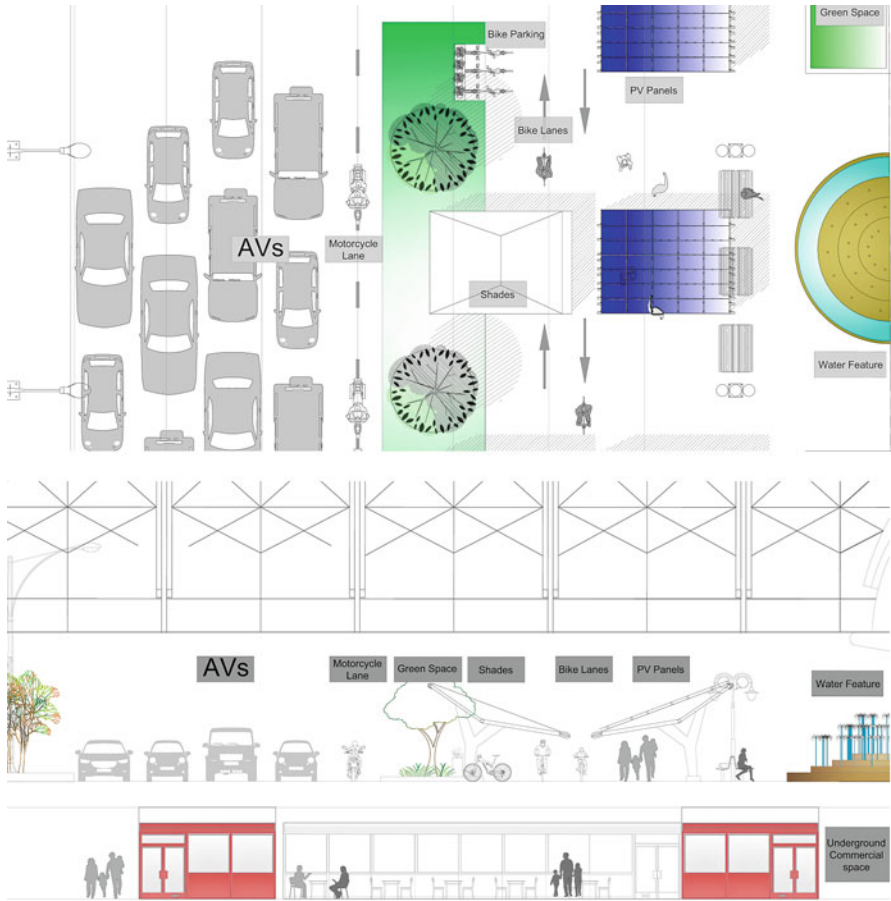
Reimagined block plan and section of Sheikh Zayed road
